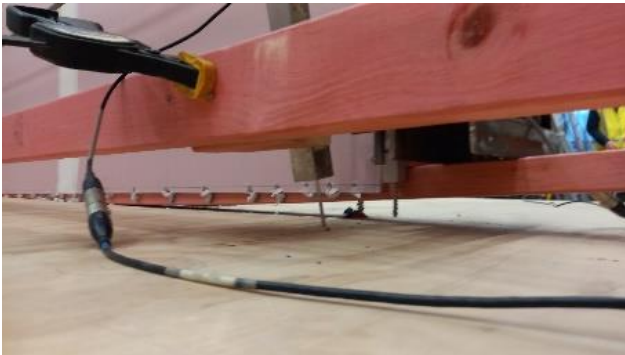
Floor damage and the exposed view of Handibrac (1.2 m perpendicular to joist orientation)
